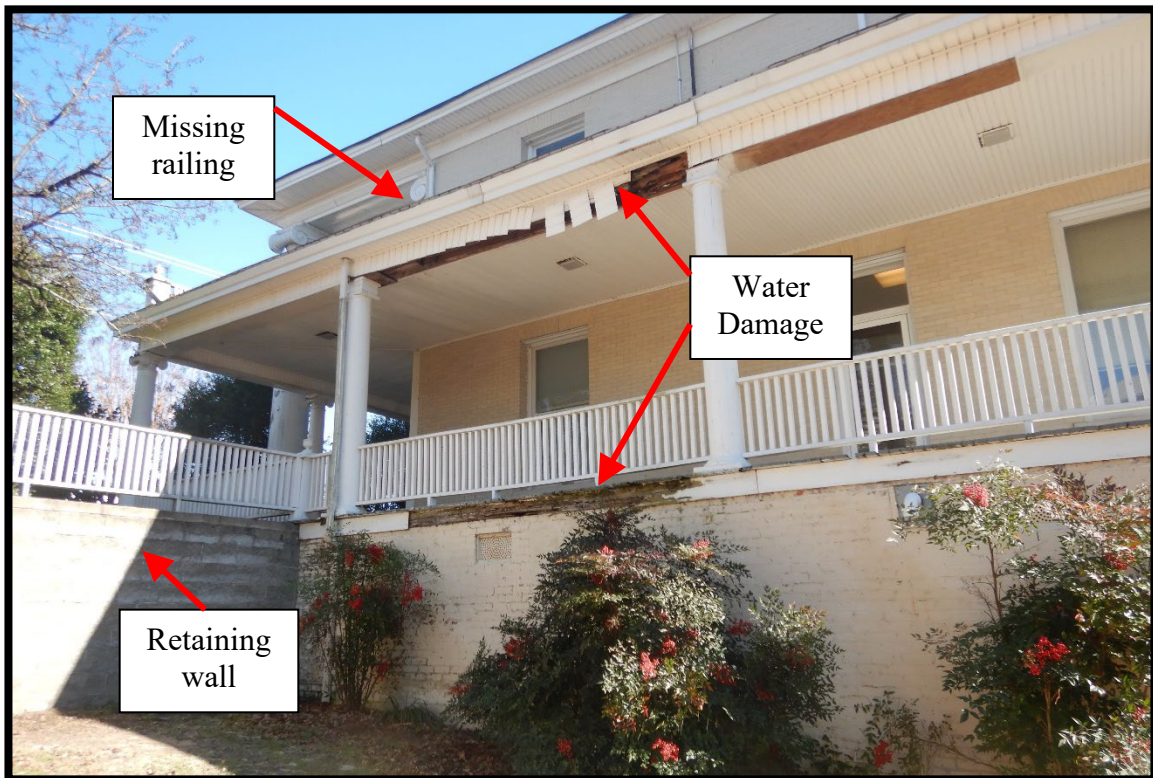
This is the right side of the structure. The railing is missing and there is severe water damage to the wood structure. This retaining wall is not original.
